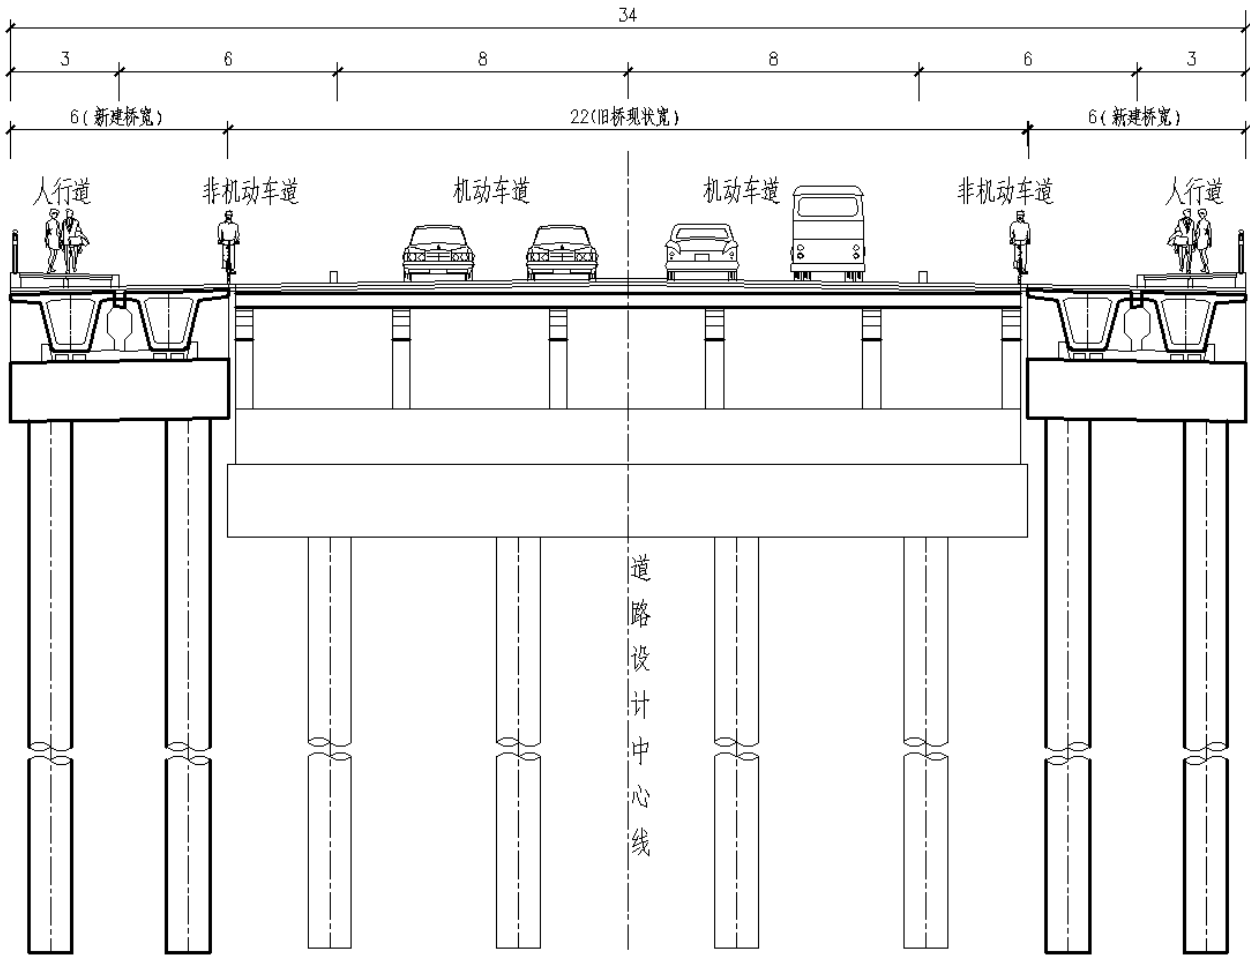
Cross Section Arrangement of Chashan River on Jiefang Avenue
